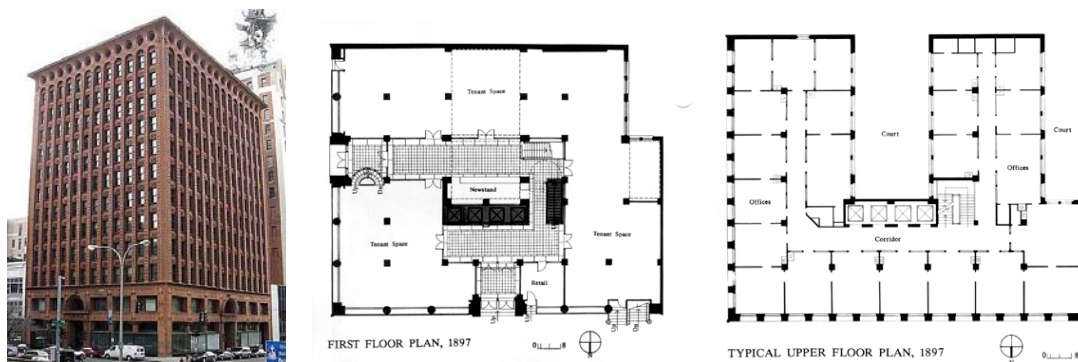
The Guaranty office building exterior view and floor plans by Louis Sullivan
